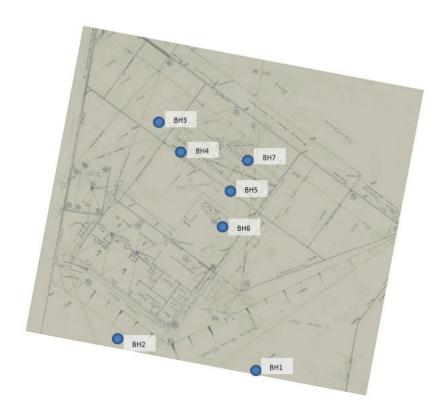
Borehole Plan (Bore hole locations illustrated on 1962 site plan)
